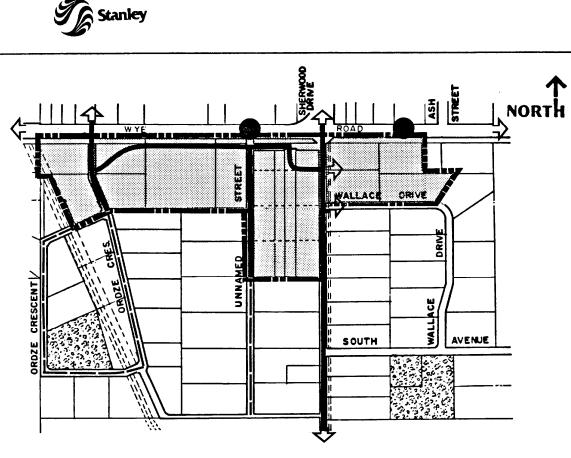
AREA ROADWAY NETWORK OPTION No.1 [DO NOTHING] turning onto and off of the service road south of Wye Road. Traffic using the unnamed roadway west of Sherwood Drive will have to use the new service road.
